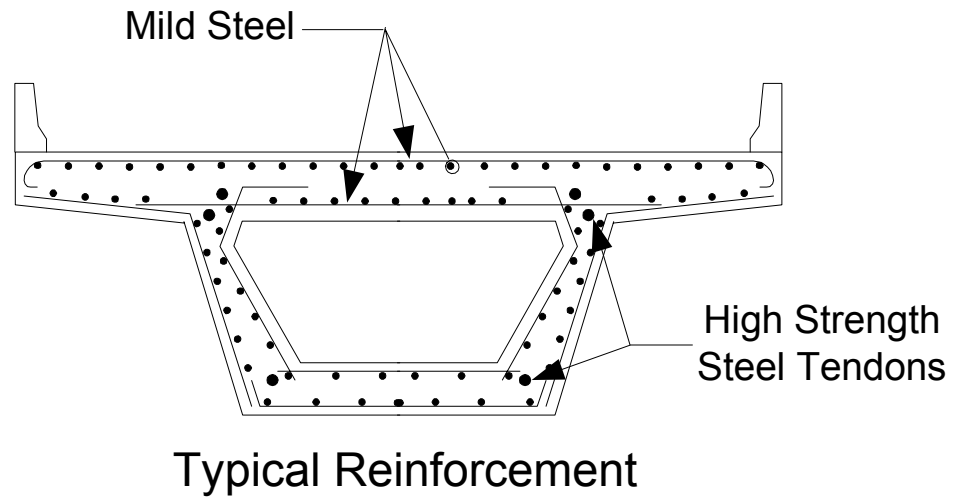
Longitudinal Reinforcement in a Concrete Box Girder
